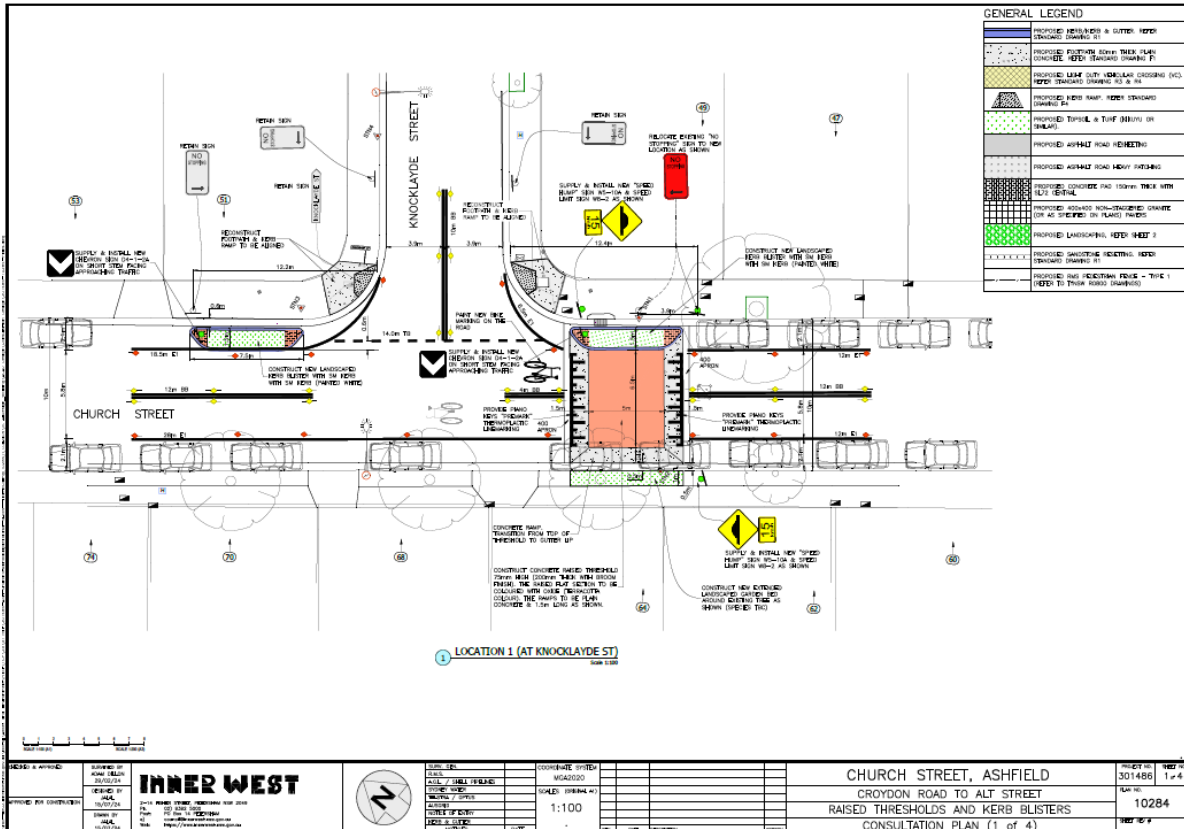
initial consultation plan 10284 (plan 1 of 4)
